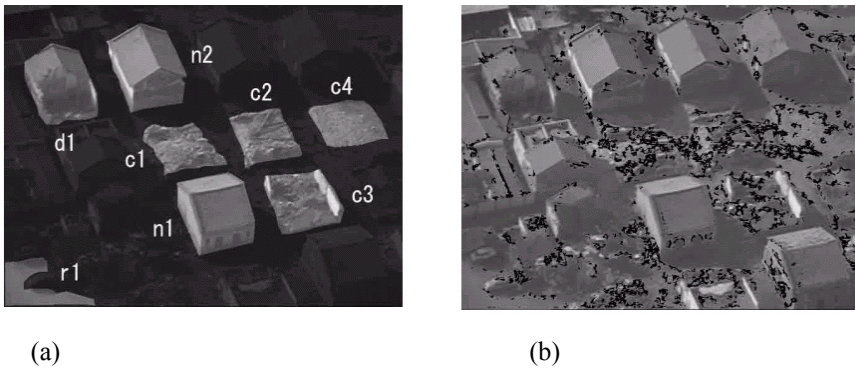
(a) Training data for automated damage detection (c: collapsed buildings, d: damaged building, n: non-damaged buildings, r: asphalt road) and (b) the extracted pixels as damaged buildings from the image of Anjar.
